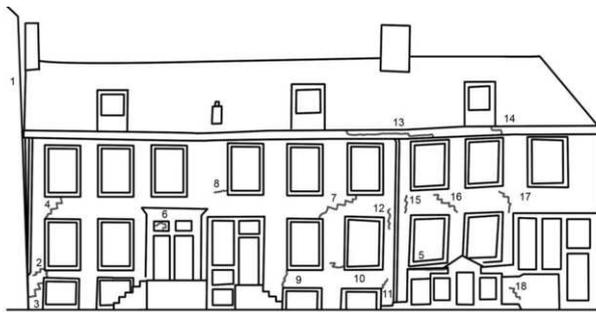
Cracks at the front façade VZG 8 - 6 - 4
